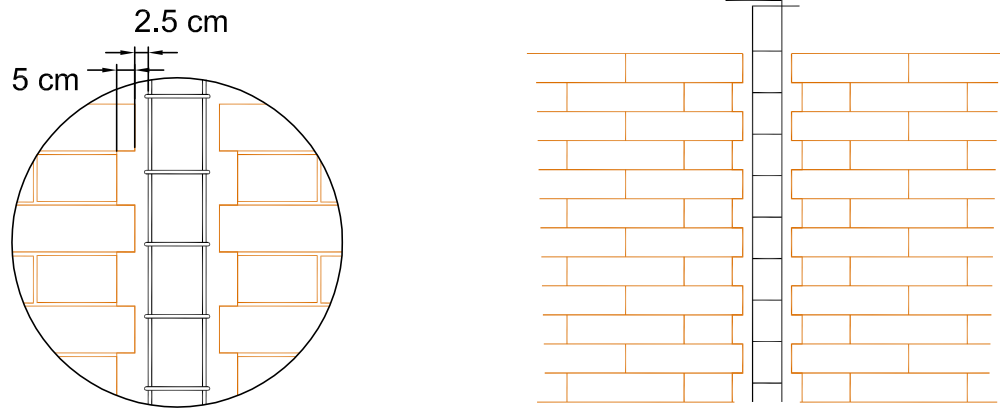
Tothed interface between two interior brick masonry walls (EERI, 2011).
